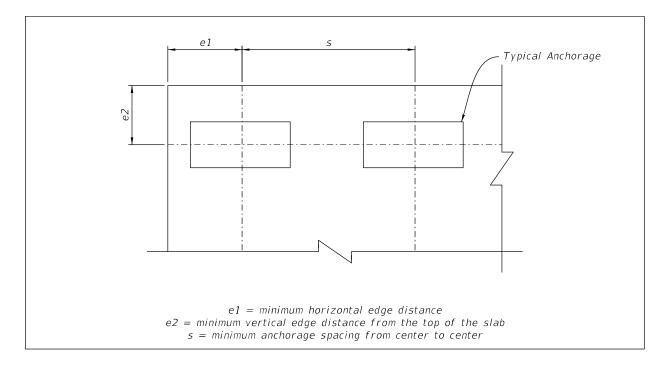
Anchorage Layout for Transverse Tendons in Box Girders or Deck Slabs
